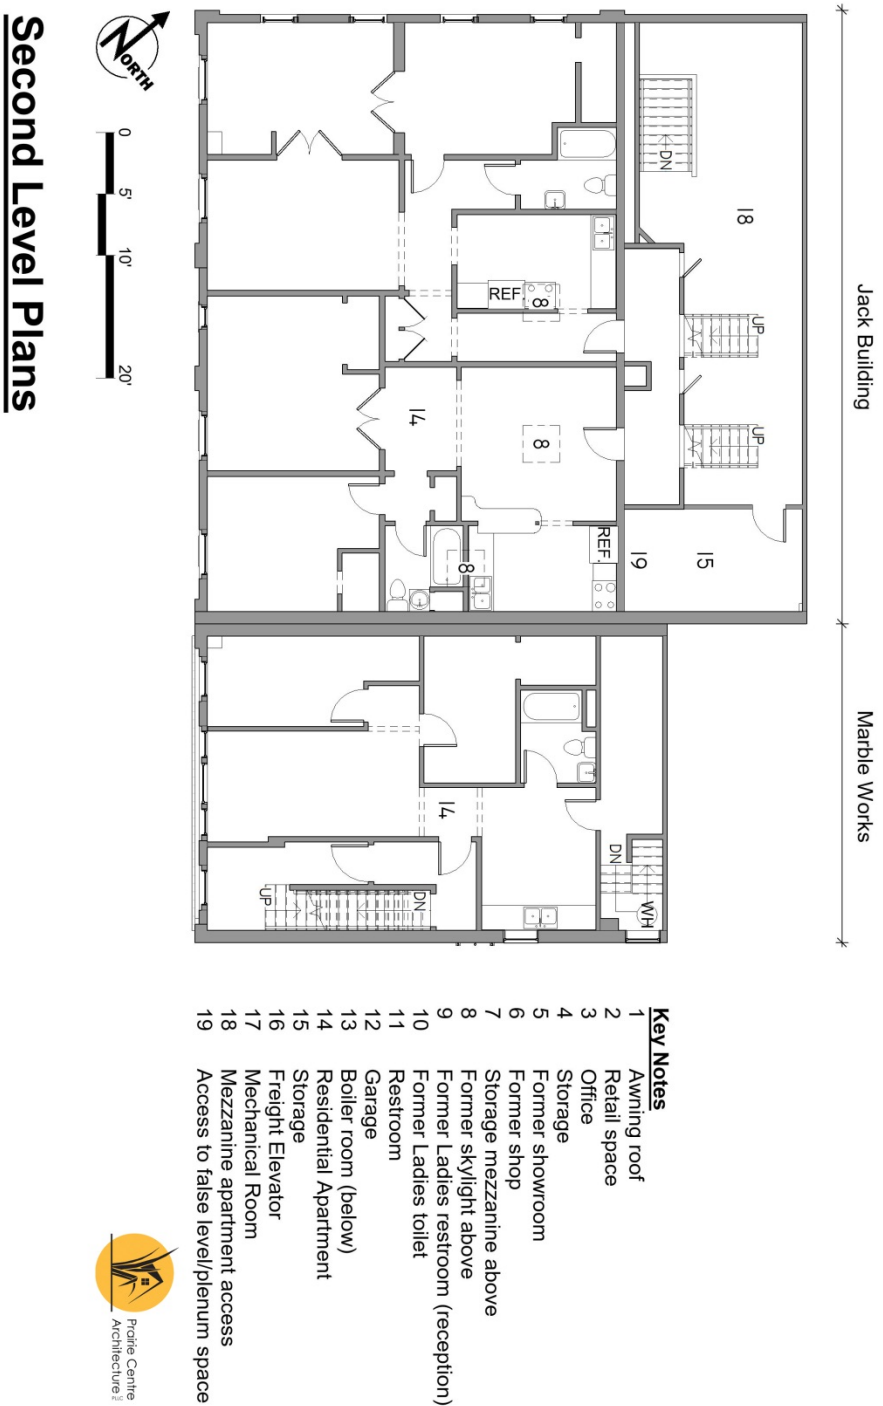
Floor plans (left –right) for Jack’s Roller Rink, Marble Works with key notes, 2020.
